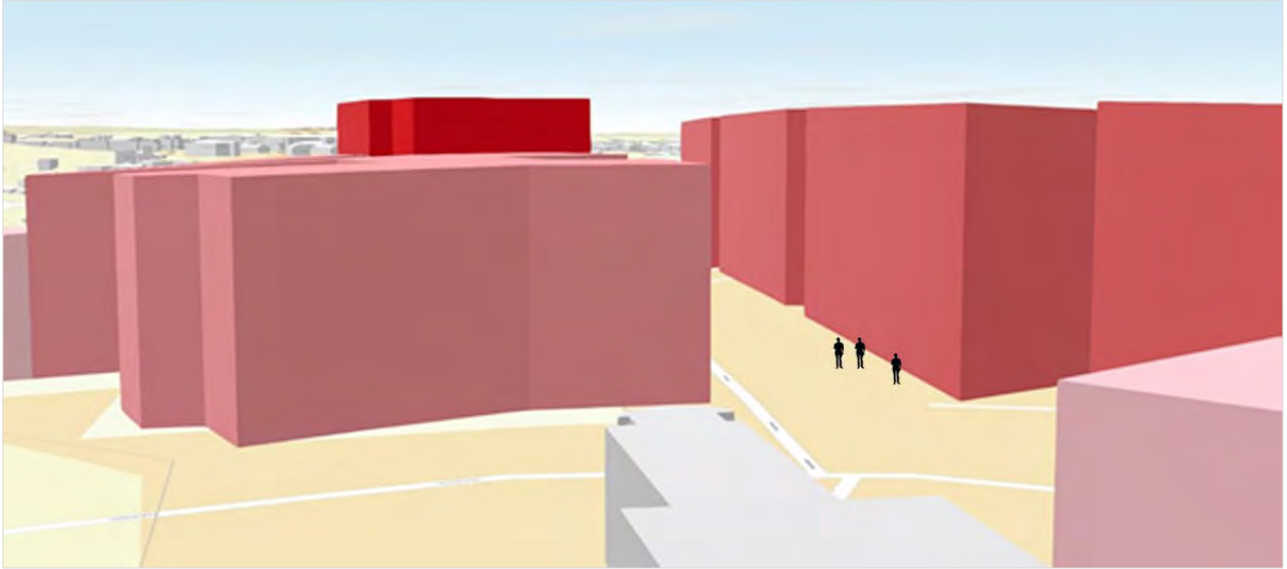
from North-West of the site with Main Street to the centre right showing ill-considered building height and separation ratios based on proposed master plan and heights
